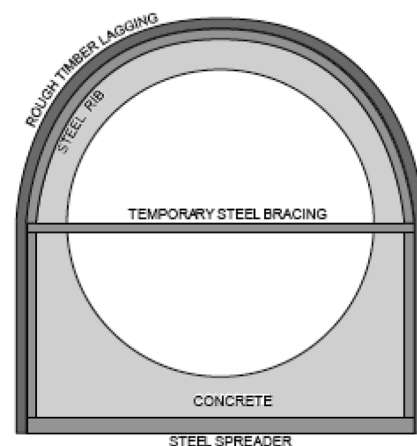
Cross section of Shepard tunnel (Woytiuk *et al.* 2008)
